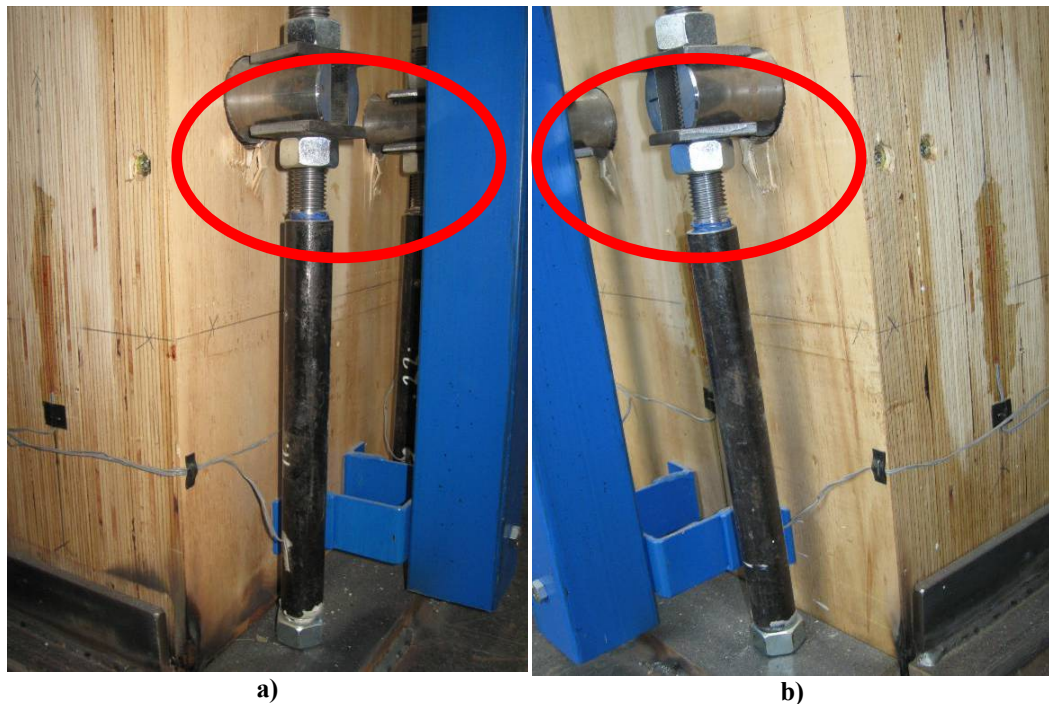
Column-base external reinforcement anchorage pin deformation at 3% Drift: a) & b) SE column
